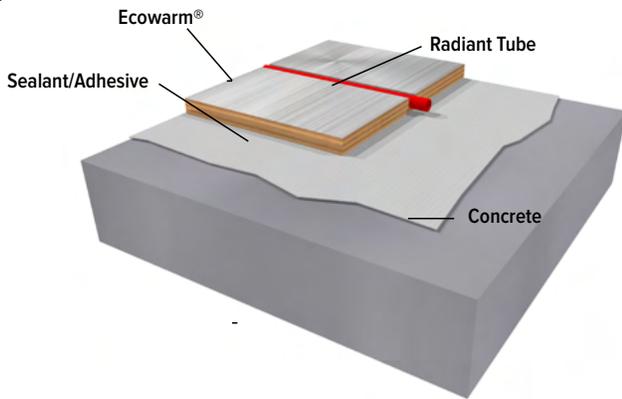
Ecowarm® Radiantboard EPS™ installed over concrete subfloor
